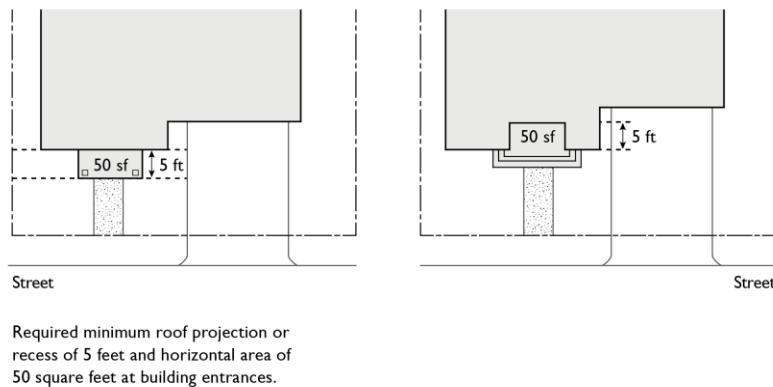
D(1): BUILDING ENTRANCE PROJECTION OR RECESS
